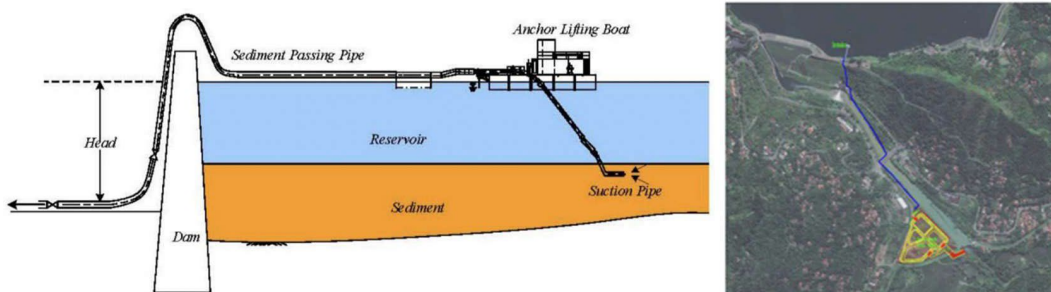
Hydro-suction: left section of the dam and right sediment pipe trajectory
